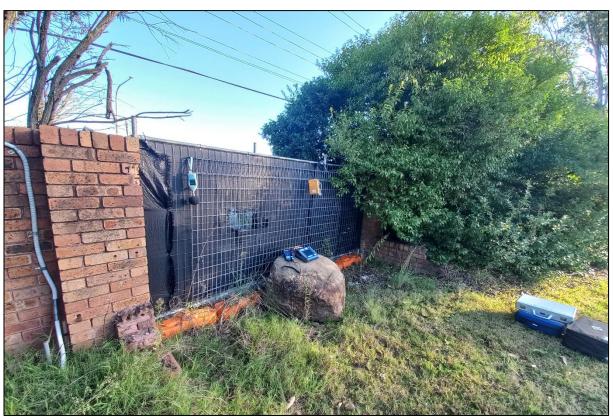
Sample location 1) - Site interior, north east corner of site, adjacent Cabramatta Road.
